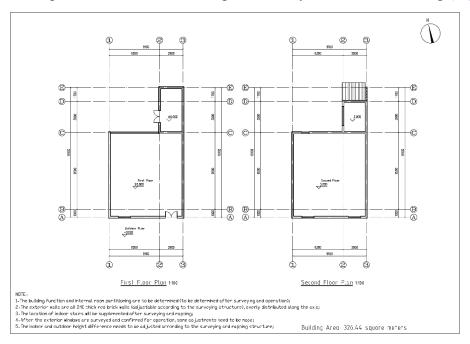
The First Floor Plan and Second Floor Plan of Sample Building No. 1 (Drawn by the author)
